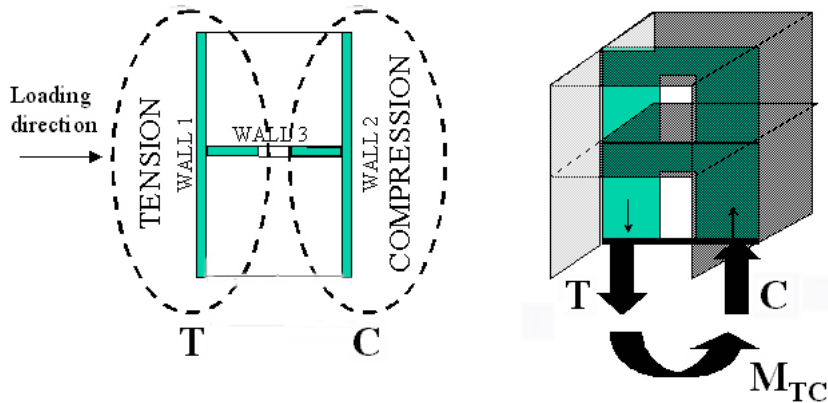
Slap-wall interaction due to tension and compression (T/C) coupling
